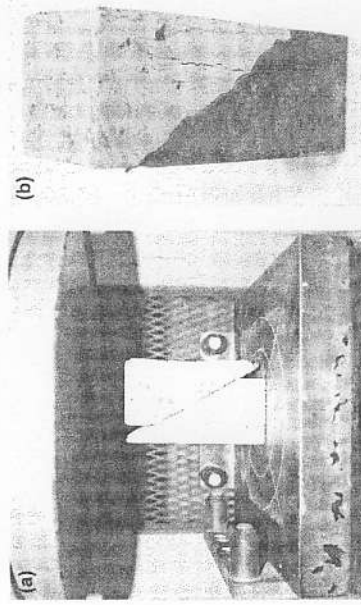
Slant specimens failure mode; (a) Adhesive failure and (b) Monolithic failure.
